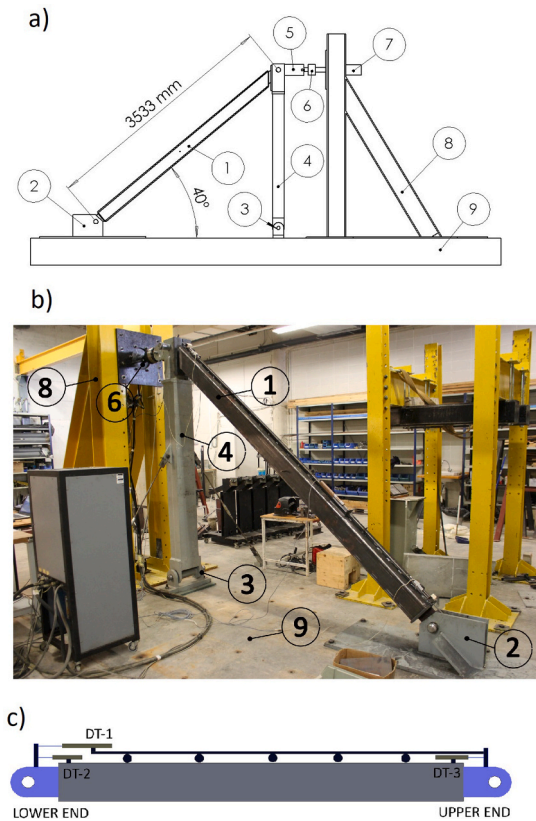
Test set-up. a) Loading system scheme: 1 CDC-BRB specimen, 2 lower brace connection, 3 lower column connection, 4 double-pinned column, 5 double-pinned struts, 6 load cell, 7 servo-controlled hydraulic jack, 8 reaction frame, 9 strong floor. b) photo of the tests set-up; c) Specimen instrumentation with displacement transducers.
